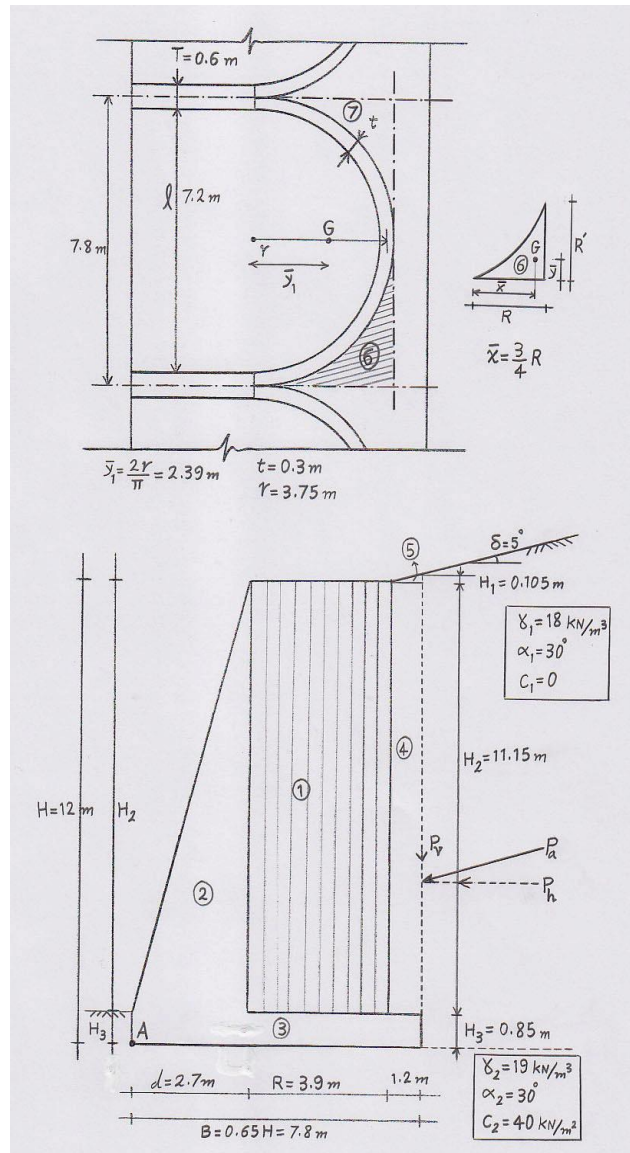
Geometrical parameters of cylindrical shell retaining wall.
